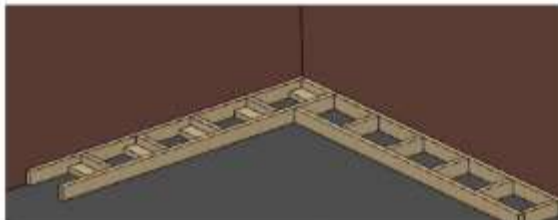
Figure C – Build all the ladder shapes and secure to floor as needed (approx. every 3 feet)
